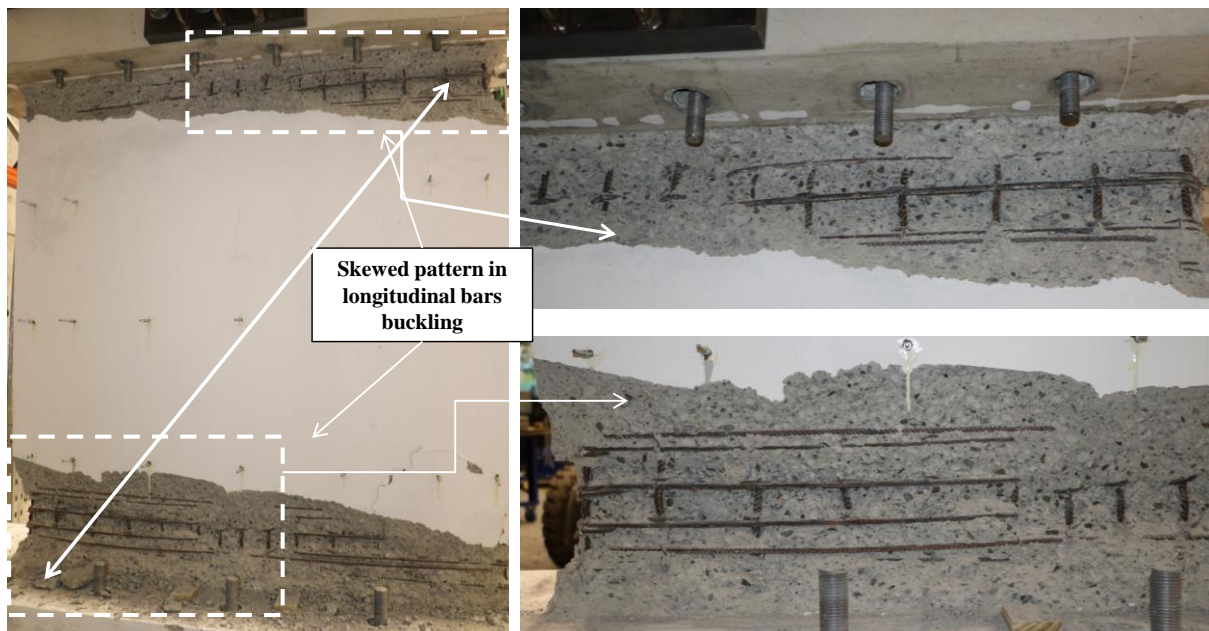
Longitudinal bar's buckling in the back face of the specimen SP4-D
